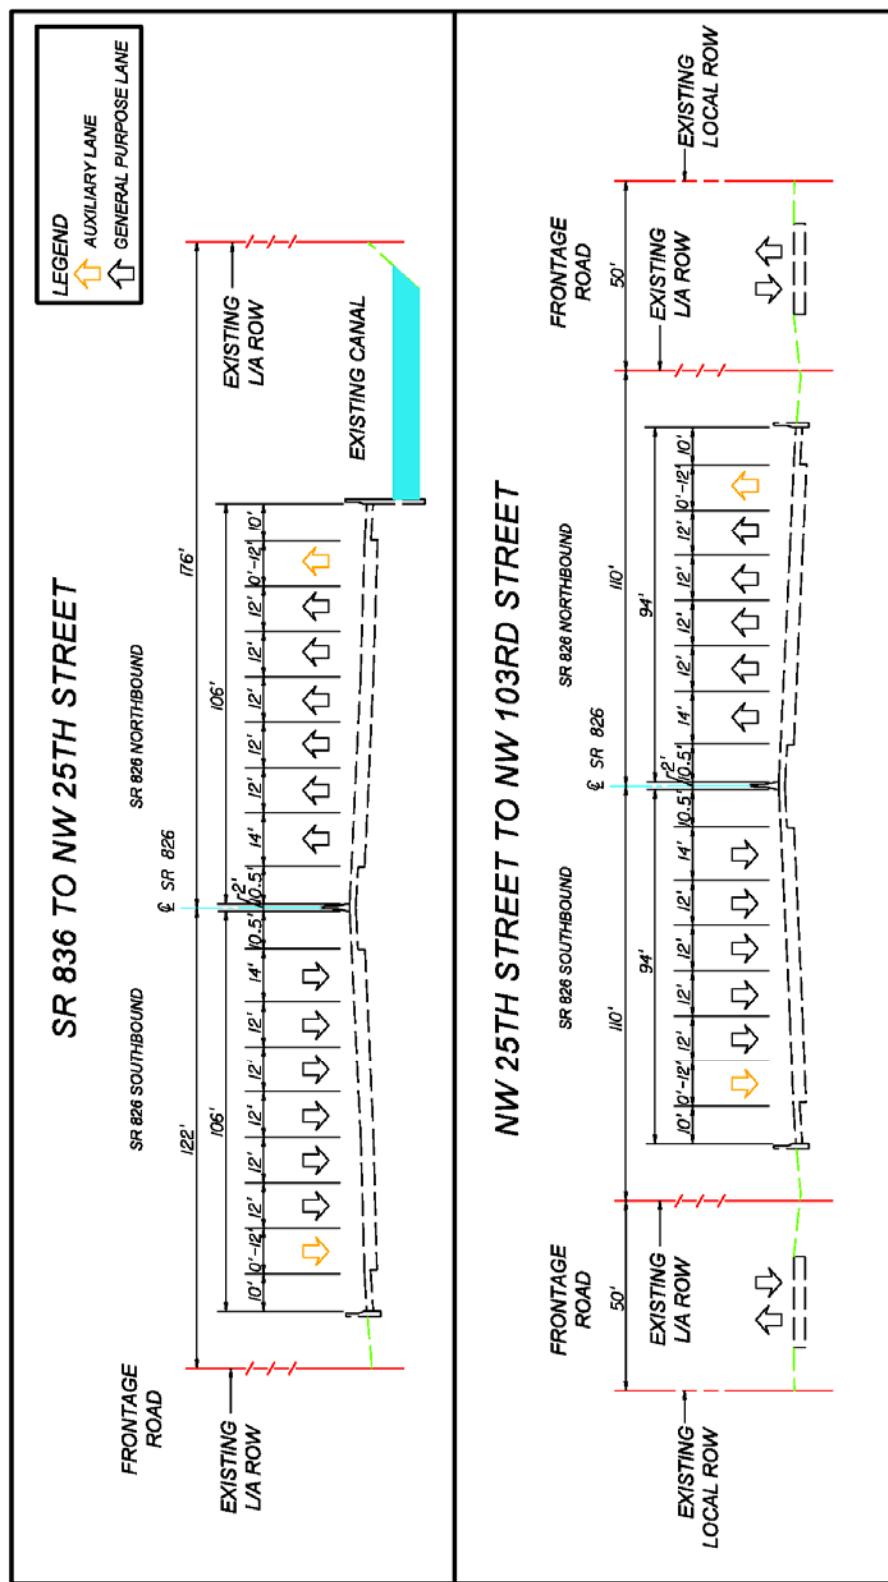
A.2 – SR 826 Existing Ten and Twelve-Lane Divided Typical Sections
